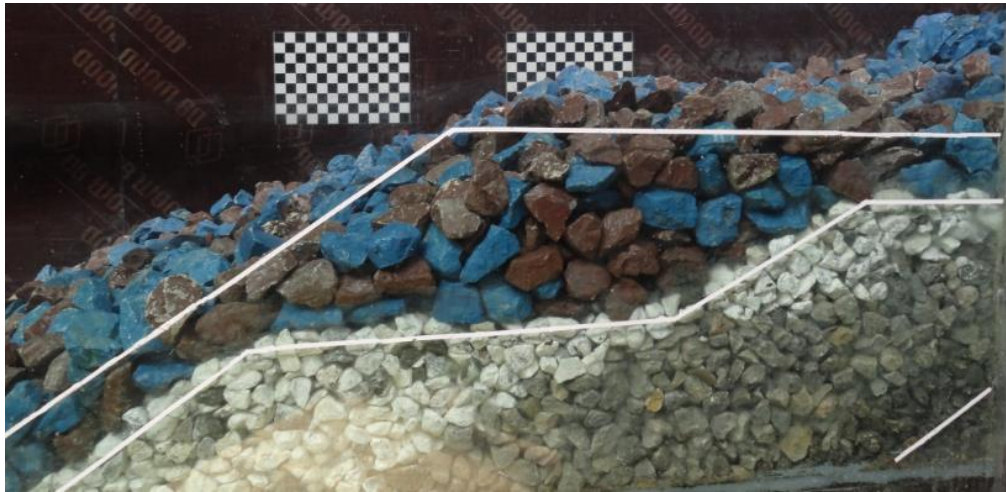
View of Section 5 after set 1 (7000 waves)
